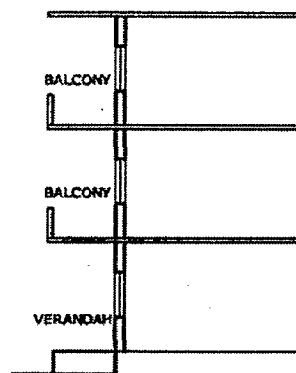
Semi-outdoor spaces in the form of verandah and balconies
